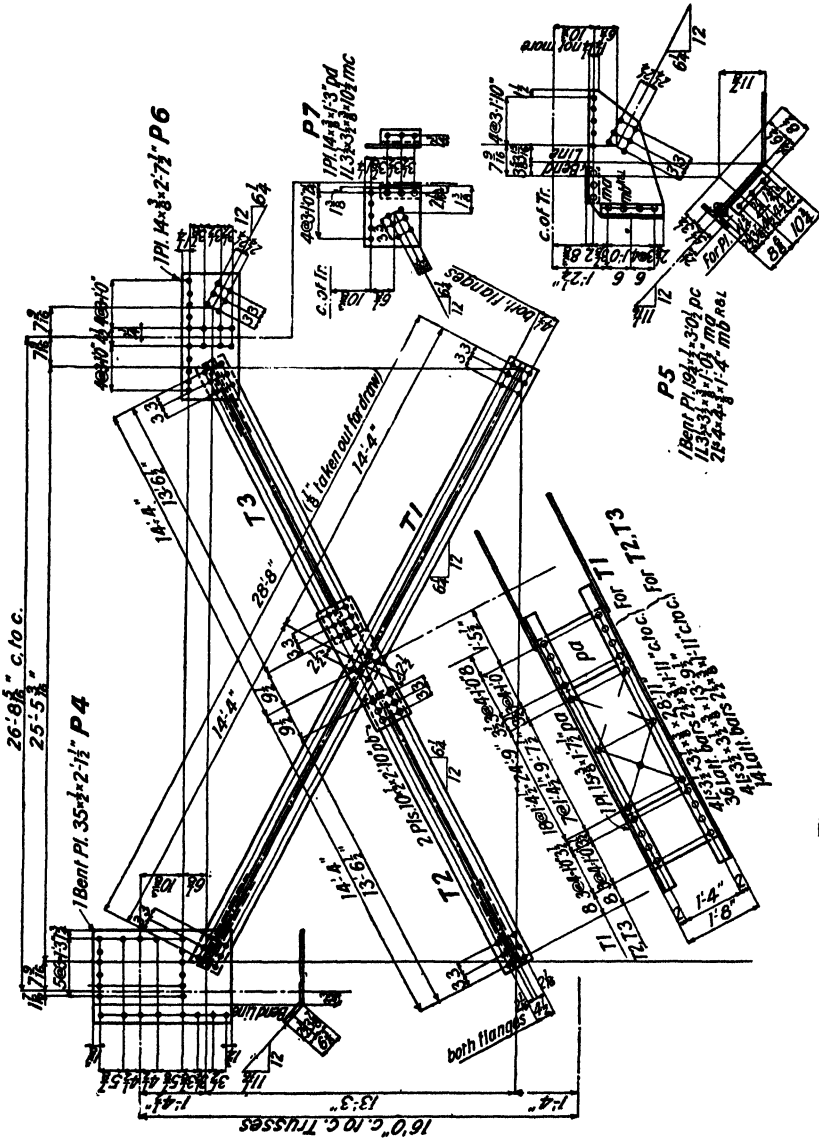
Top Lateral Bracing for a Railroad Bridge.
